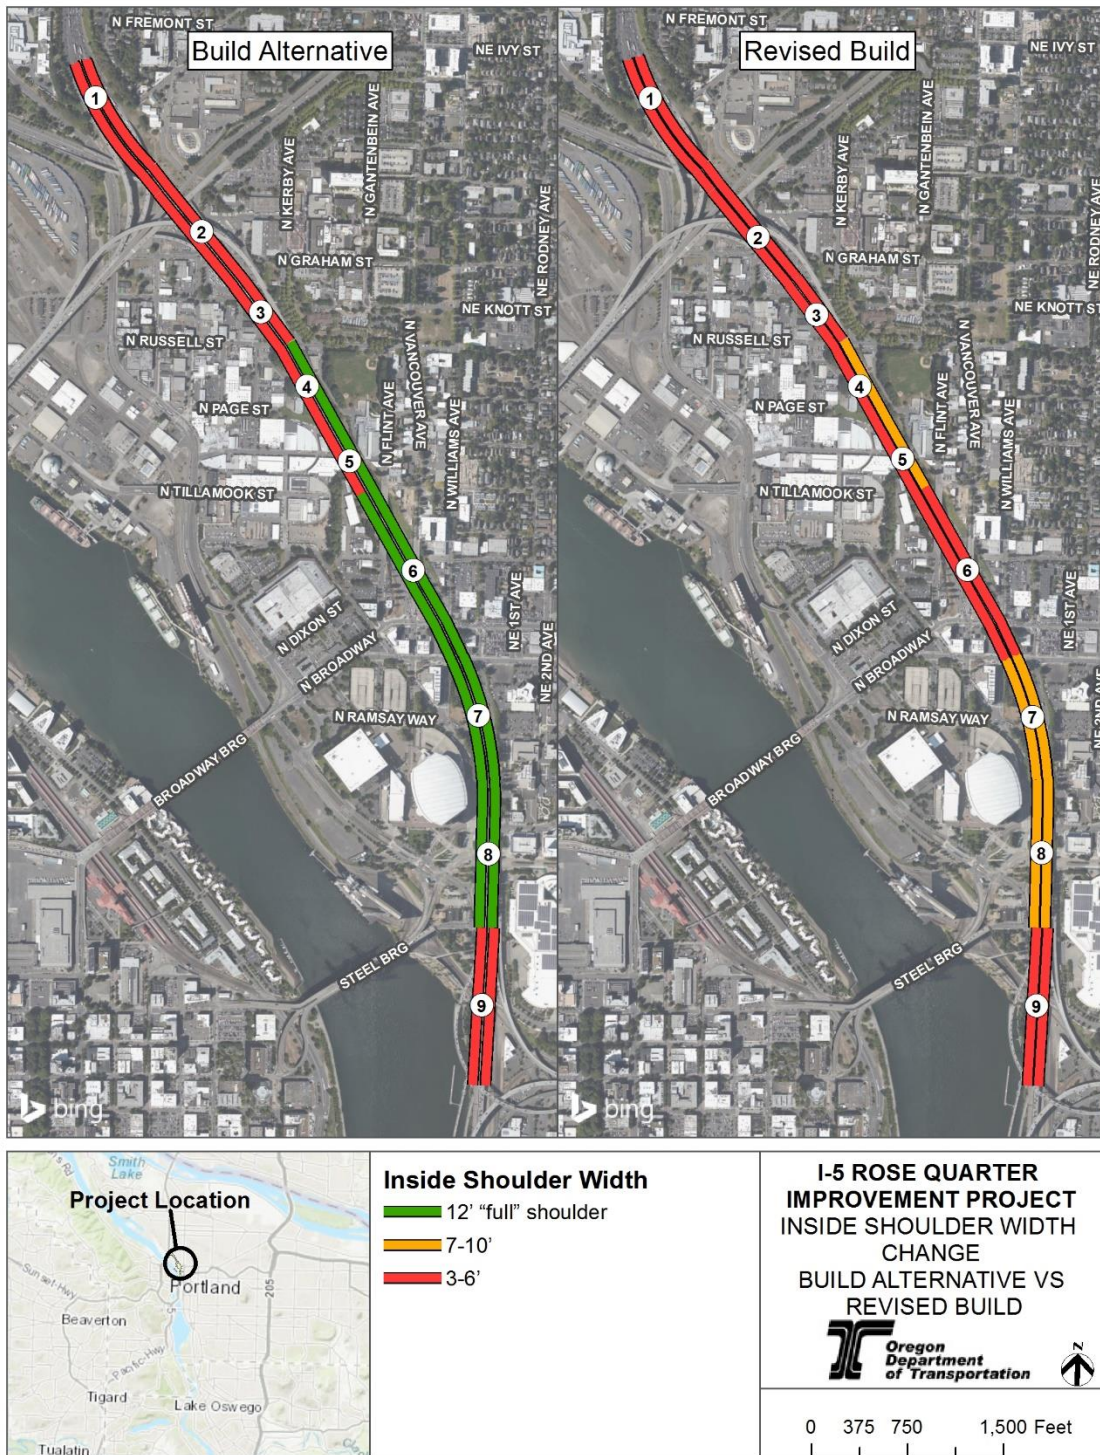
Inside Shoulder Width of Study Corridor for Build Alternative and Revised Build Alternative
